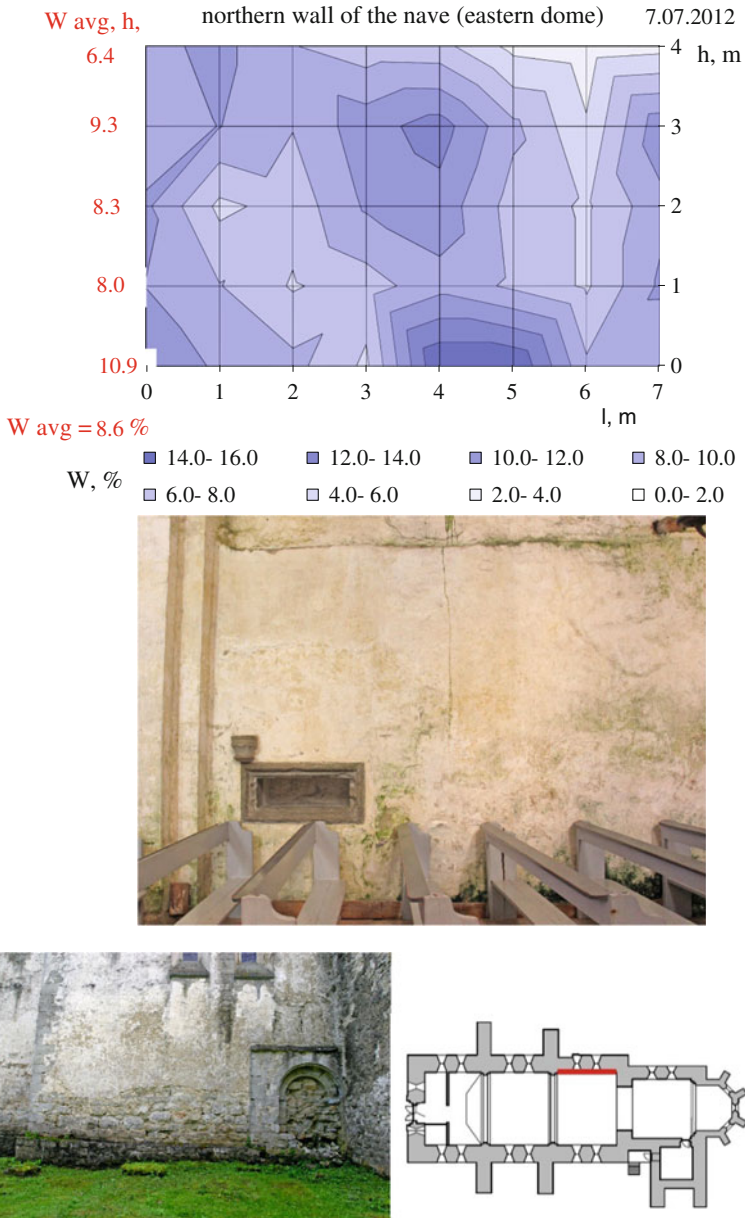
Multiple water sources in this case: rising dump, condensed water, leakage through the wall and windows, Valjala Church. Measuring depth up to 30 cm. Pictures of wall from the inside and outside; wall location on church plan
